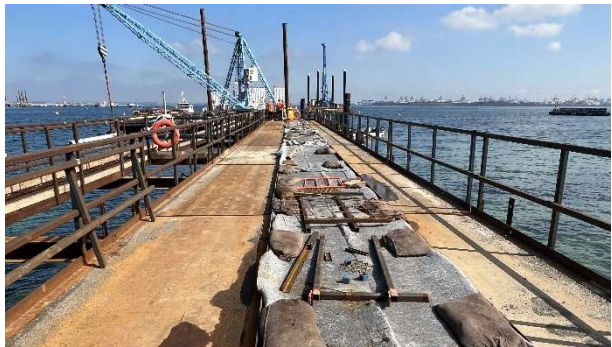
Piling Barge. Boom deployed around localised works. Spill kit observed upon the barge.
